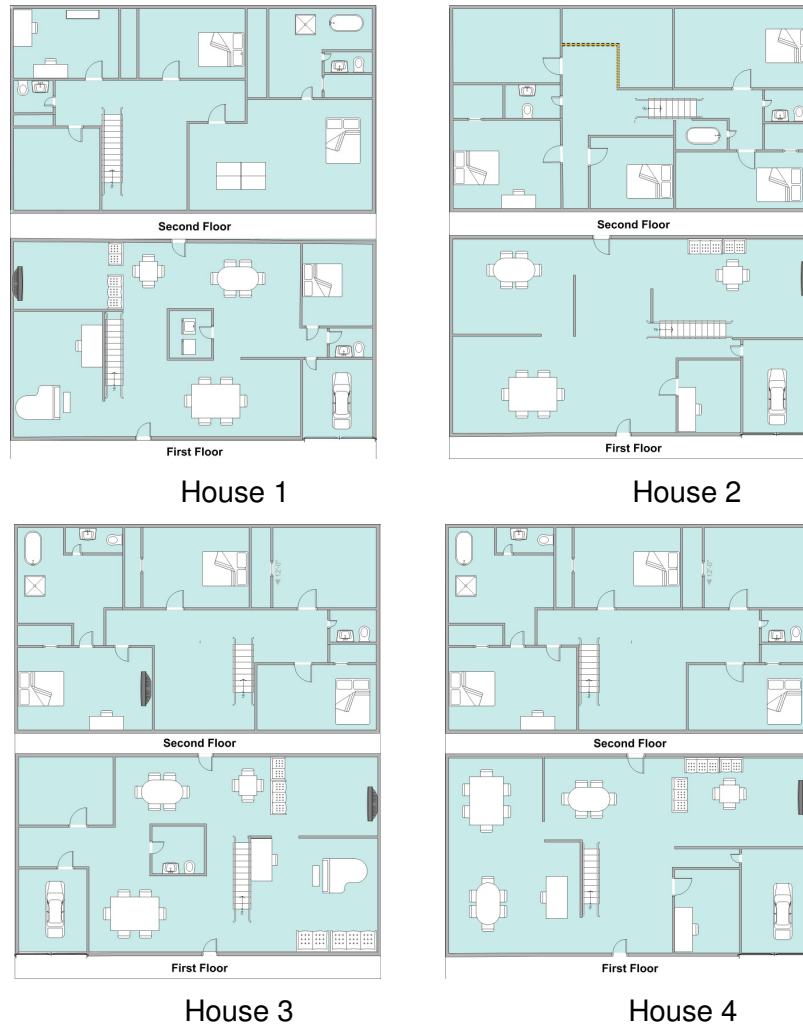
The Floor Layouts of Four Typical Residential Houses Used for the Tests.
